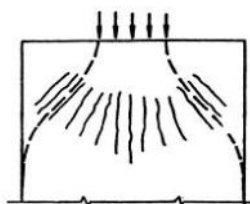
Planar Sketch of Cracks in the Anchorage Zone of a PSC Structure due to Inadequate/Bursting Reinforcement
